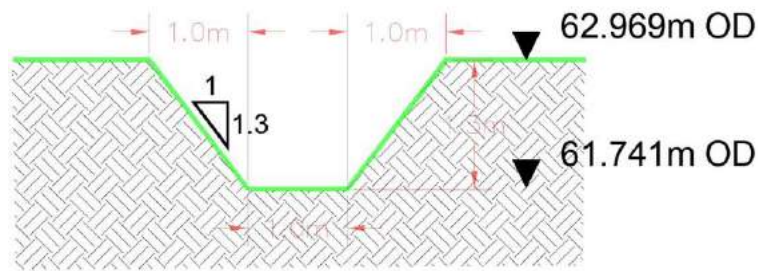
Typical Geometric Profile of Diverted Drainage Channel 1
